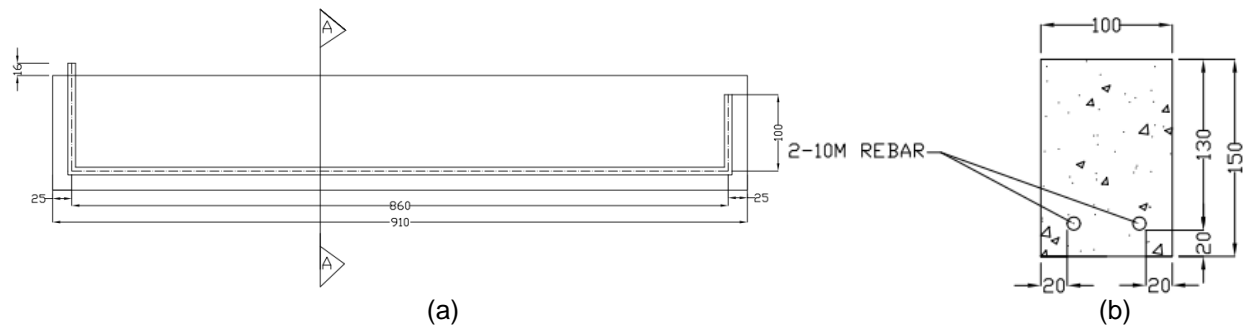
Concrete beam specimen: (a) Longitudinal view (b) Cross sectional view (15)
